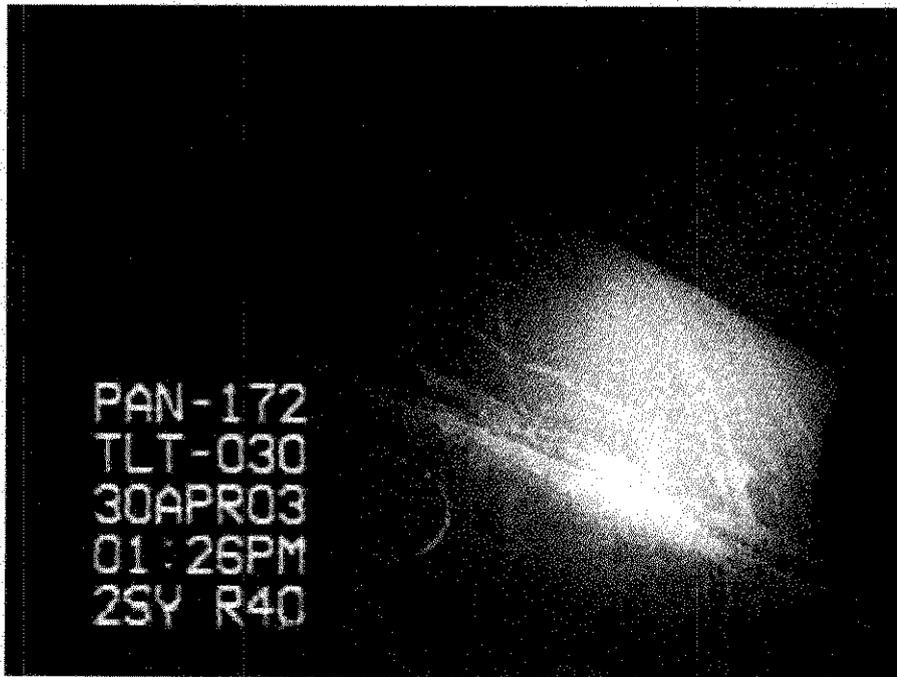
SY-102 Riser 40, Primary Tank, Haunch/Vertical Weld/Construction Marks (2003)
